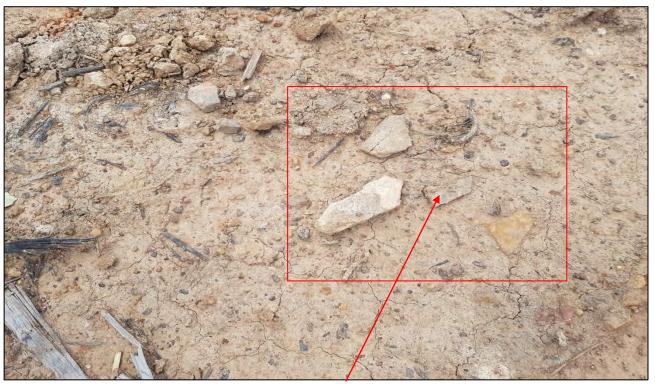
Un-lined concrete washout bay, as observed on 16.01.2018.
